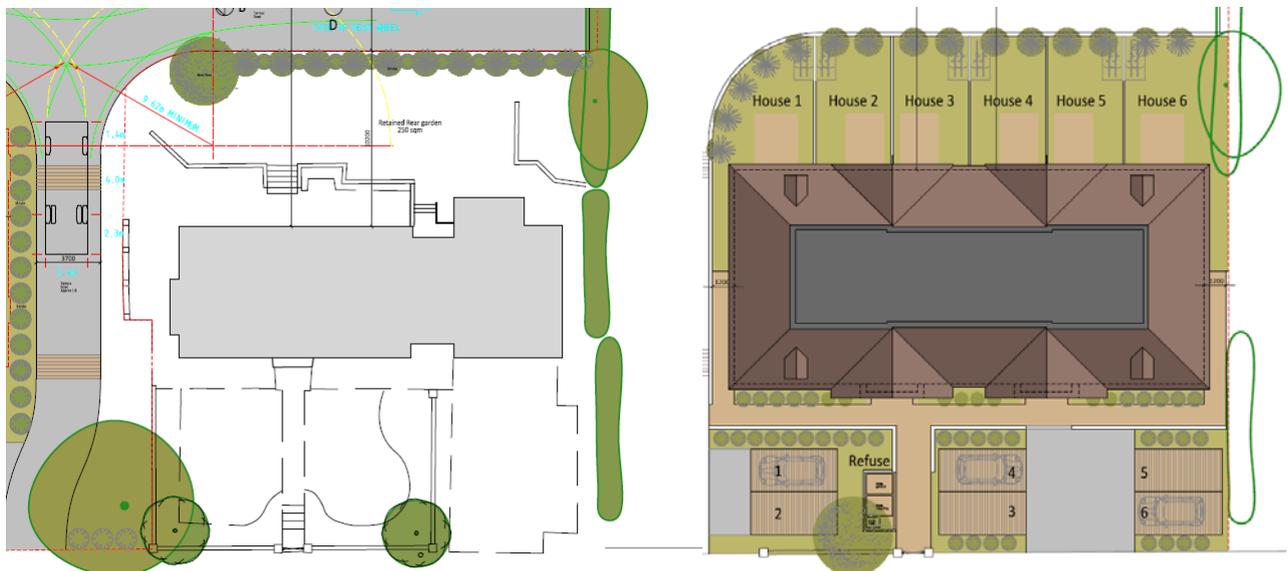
Existing and Proposed Plan Including Landscaping (Indicative only)
